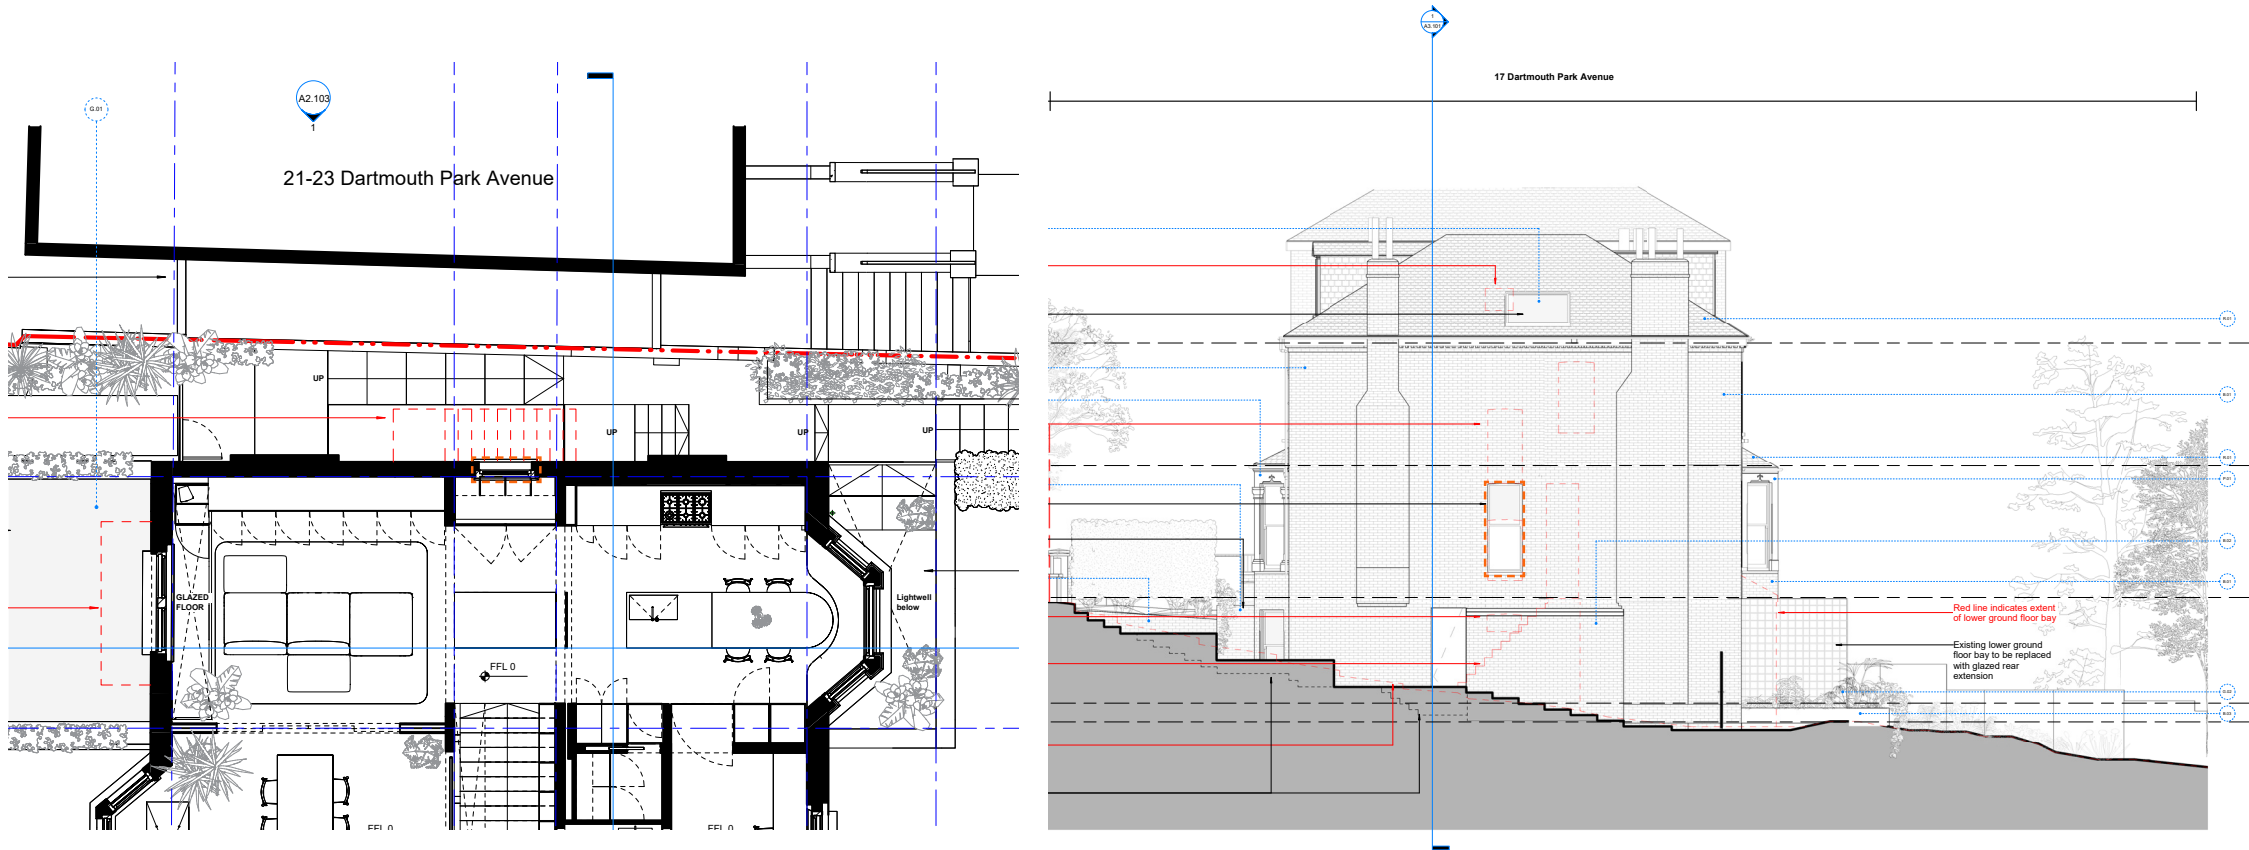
Previous Ground Floor Plan and North Elevation with sash window located in walk-in kitchen storage unit
